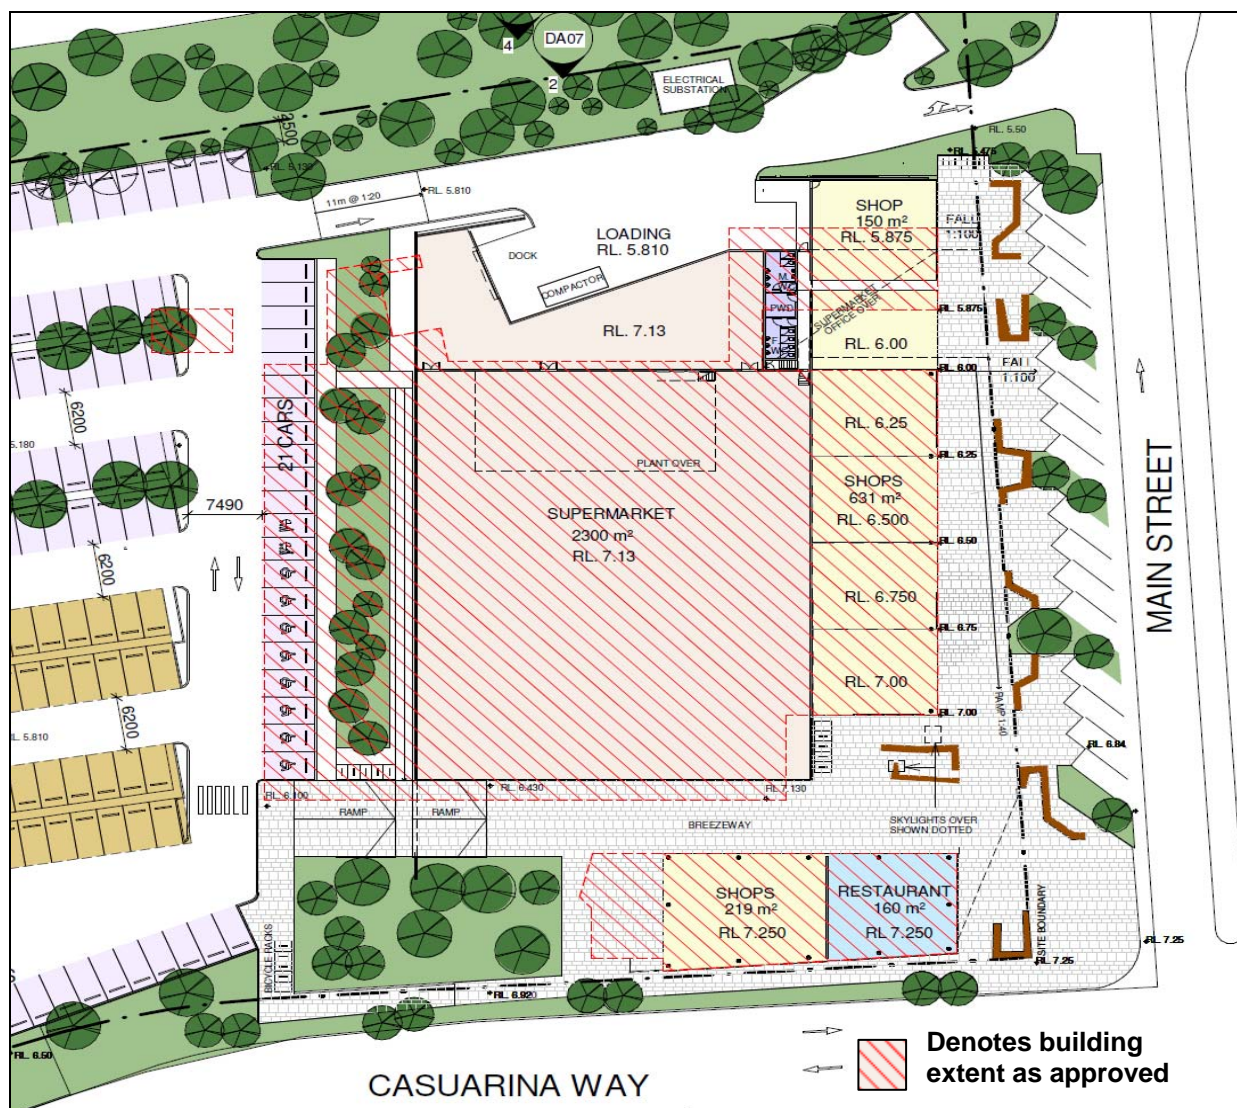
Proposed Retail Centre Overlayed with Building Extent as Approved (source: proponent)
